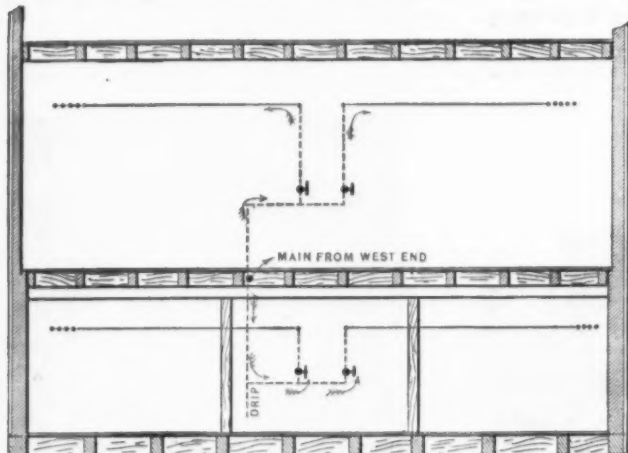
East Wall and Cross-Section of Post-Office Shop.
